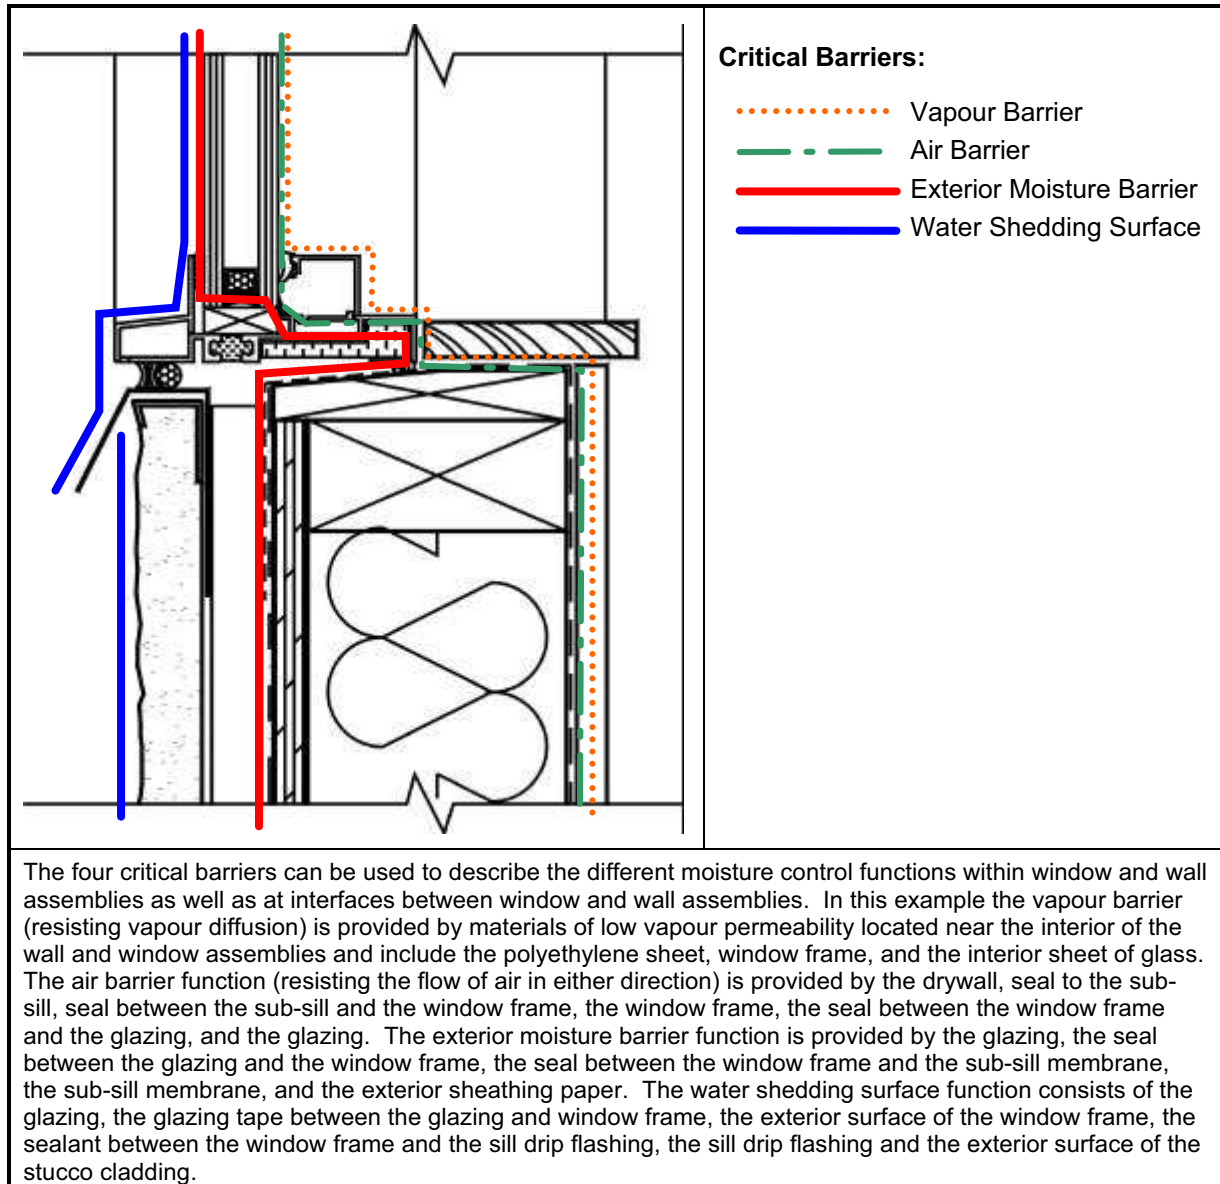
Continuity of Critical Barriers at Window to Wall Interface
